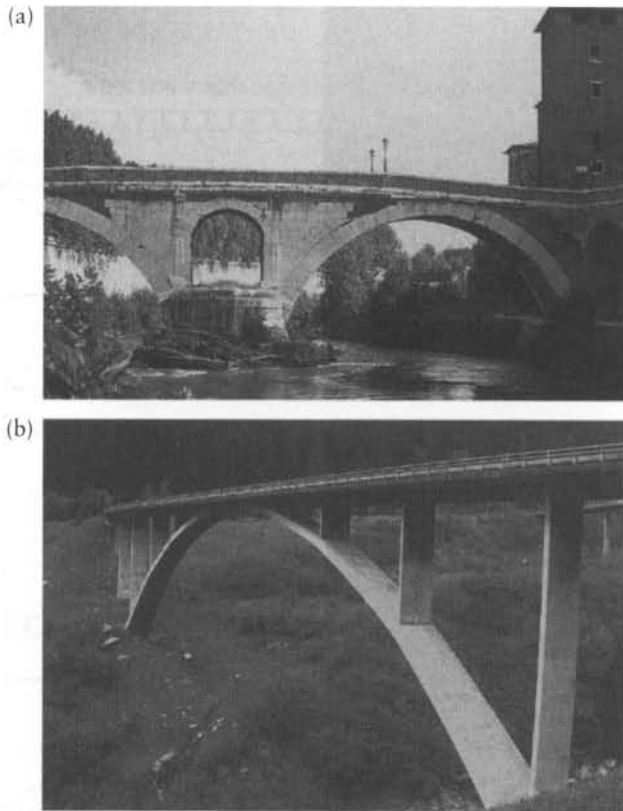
Arch bridges. (a) Stone blocks. (b) Concrete.
